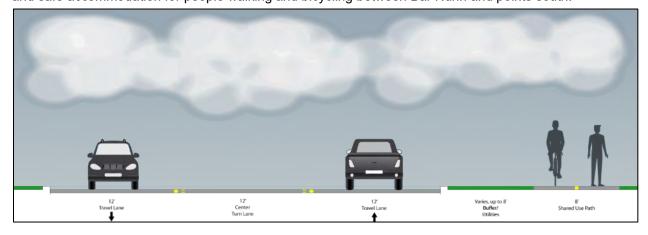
CONCEPT #6 - CROSS-SECTION IMPROVEMENTS WITH SHARED USE PATH, TYPICAL SECTION
